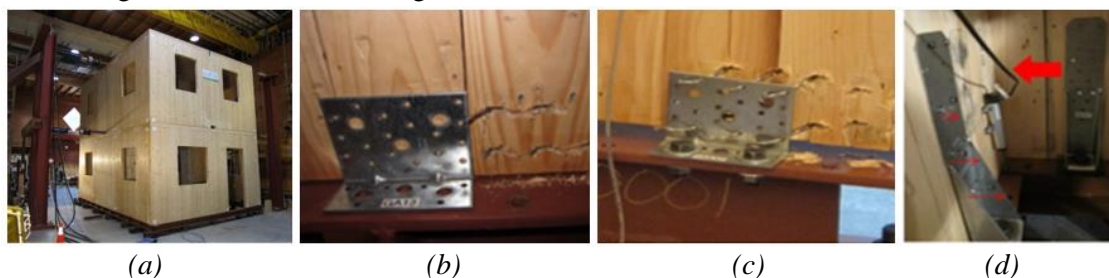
Failure mechanism in bracket connections of a two-story CLT house: (a) Full-scale modular CLT house (b) wood failure due to nail fatigue resulting from sliding of the panel, (c) nail withdrawal and yielding due to bi-directional loading, and (d) partial withdrawal of nails from off-the-shelf hold-downs (Popovski & Gavric, 2016).
